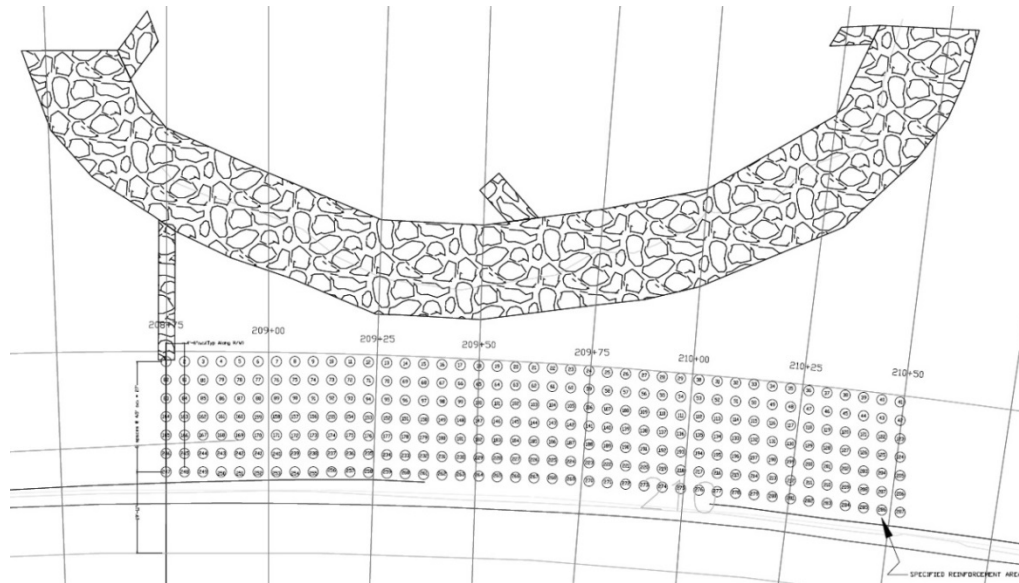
The Geopier layout is shown relative to the stream and the protective slope riprap.
